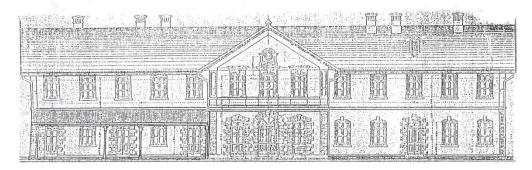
Ist class station building project drawn for Ankara-Eskişehir/ Platform elevation. (Source: Araz, 1995)
